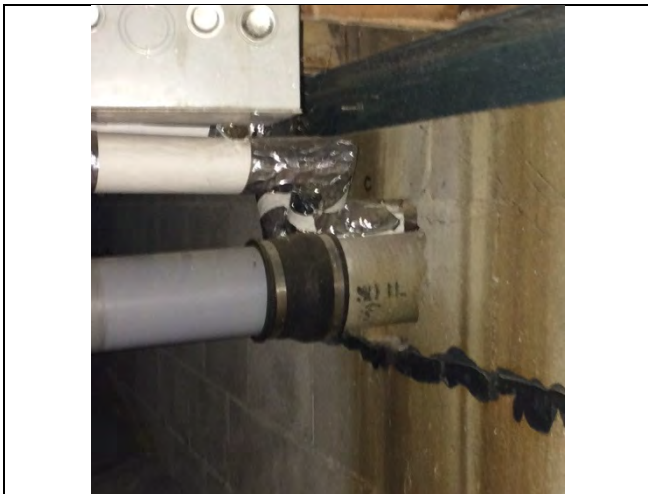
Presumed asbestos-containing cement pipe observed in the crawlspace.
